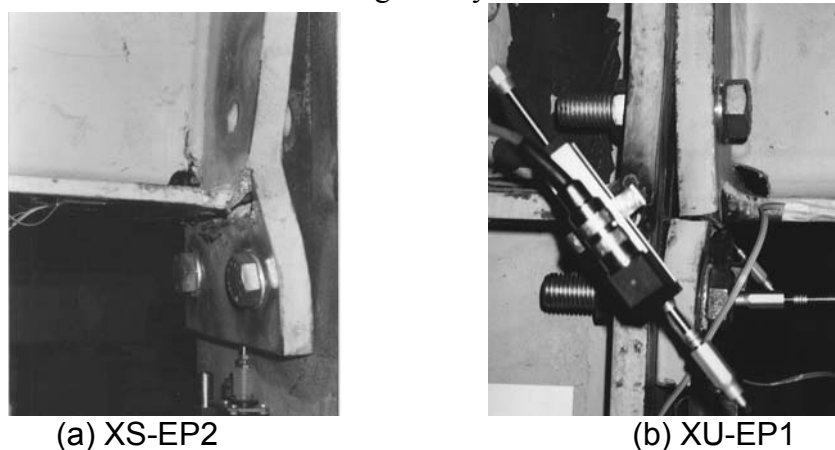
Cracking of the bottom flange and end plate (a), and rupture of the end plate (b).
